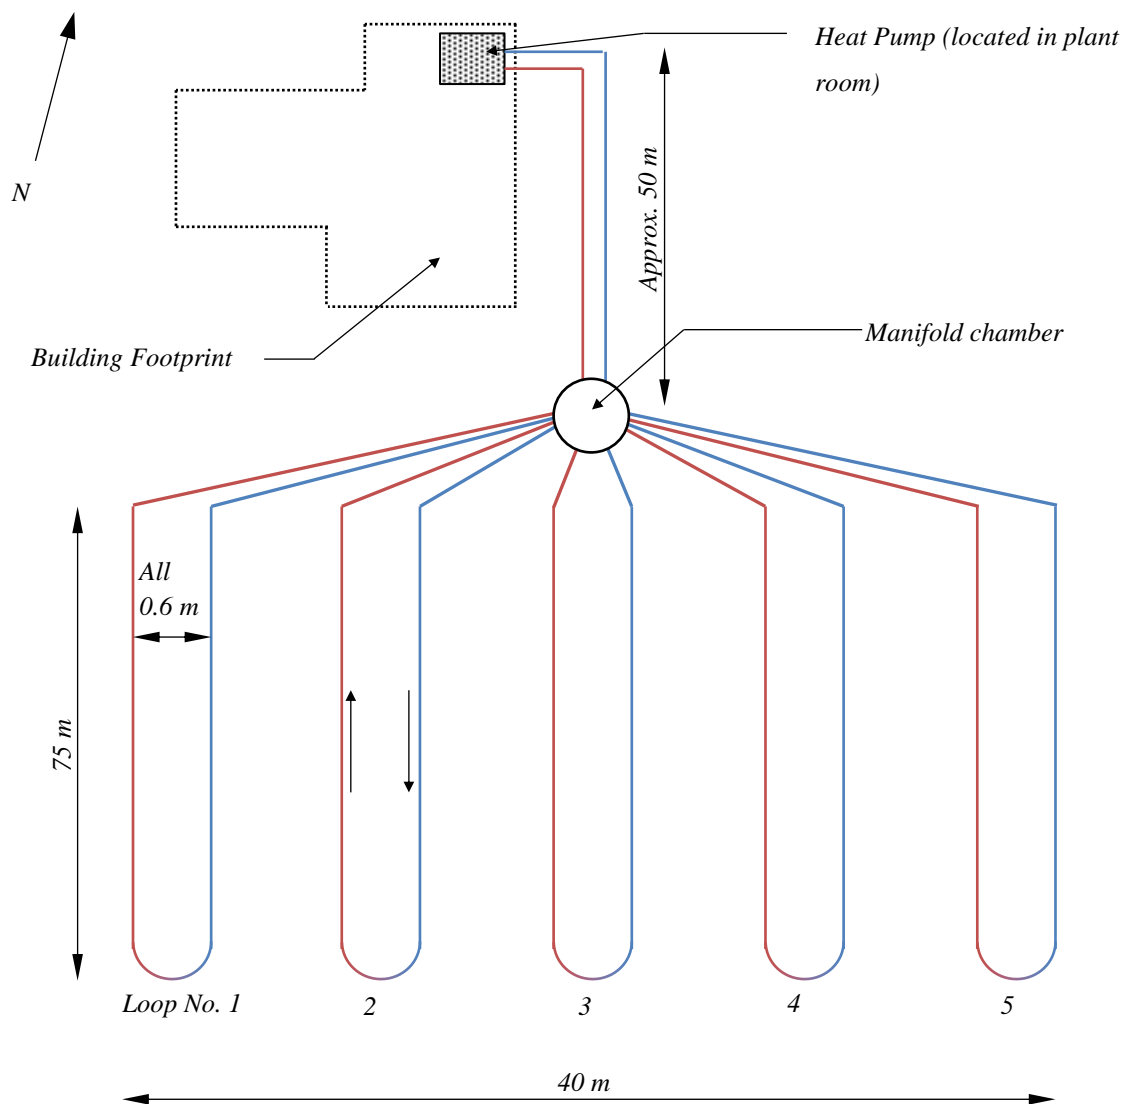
Schematic of the horizontal ground source heat system installed at the monitoring site (plan view).
